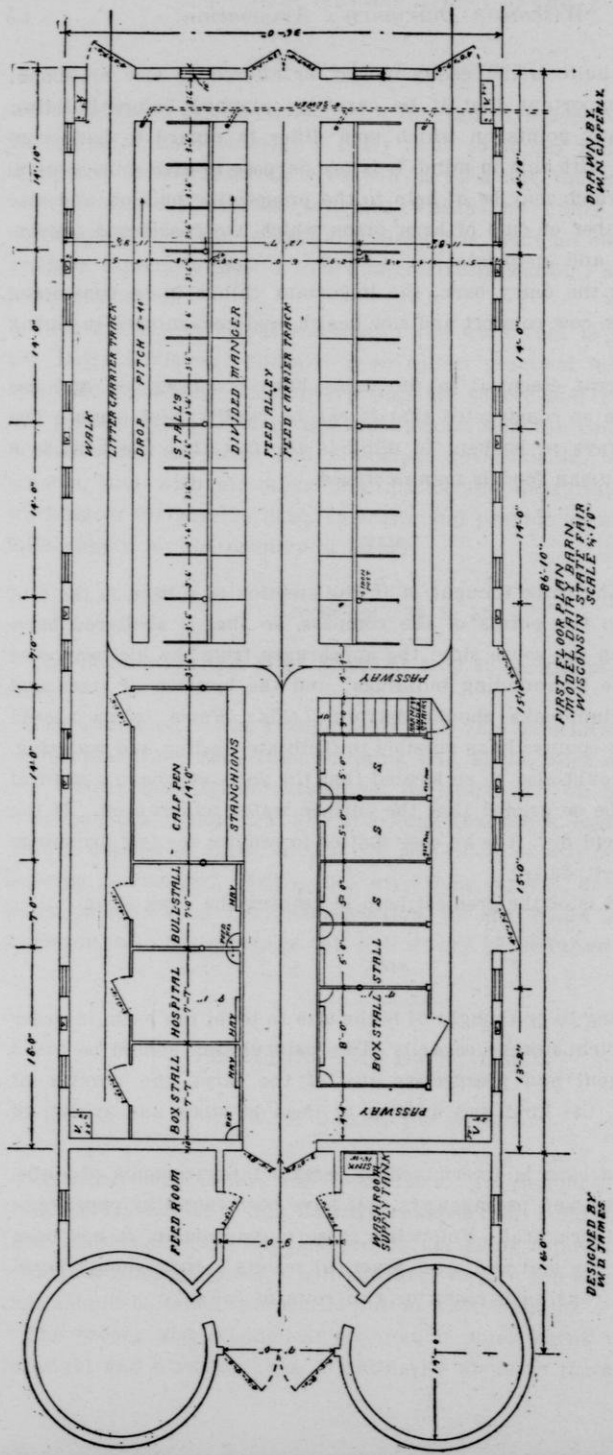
FIRST FLOOR PLAN OF MODEL DAIRY BARN AT THE WISCONSIN STATE FAIR.
